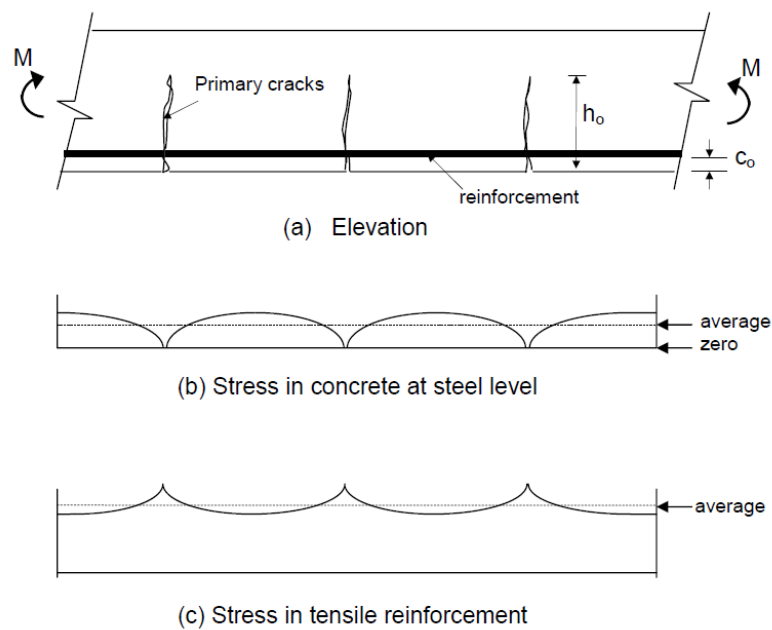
Stresses in a cracked reinforced concrete member (Gilbert & Nejadi, 2004).
